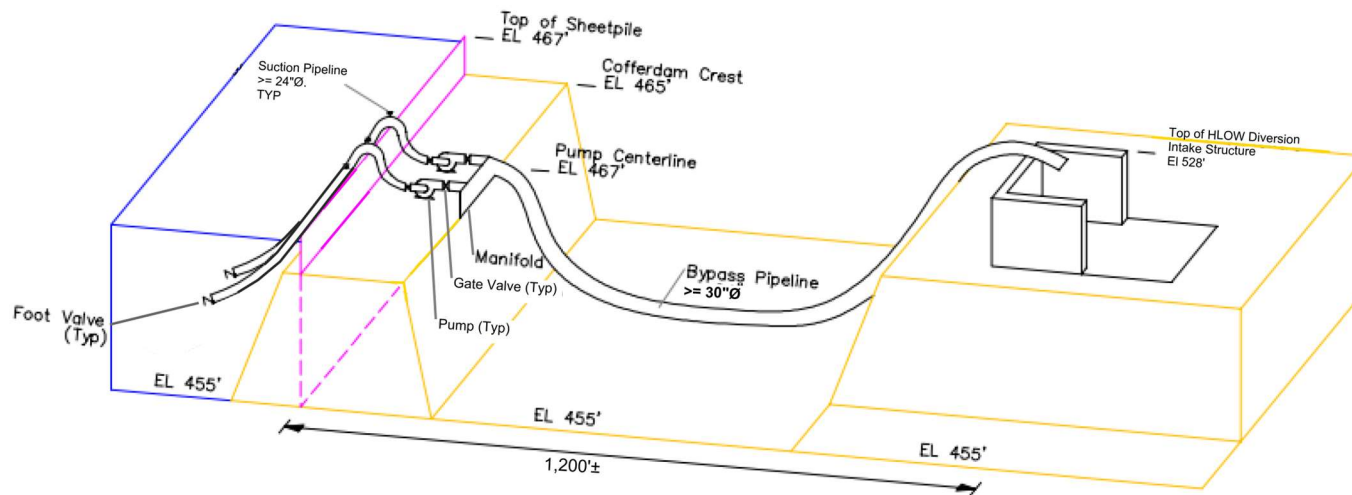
Pump placement on the cofferdam crest at elevation 465 ft.
